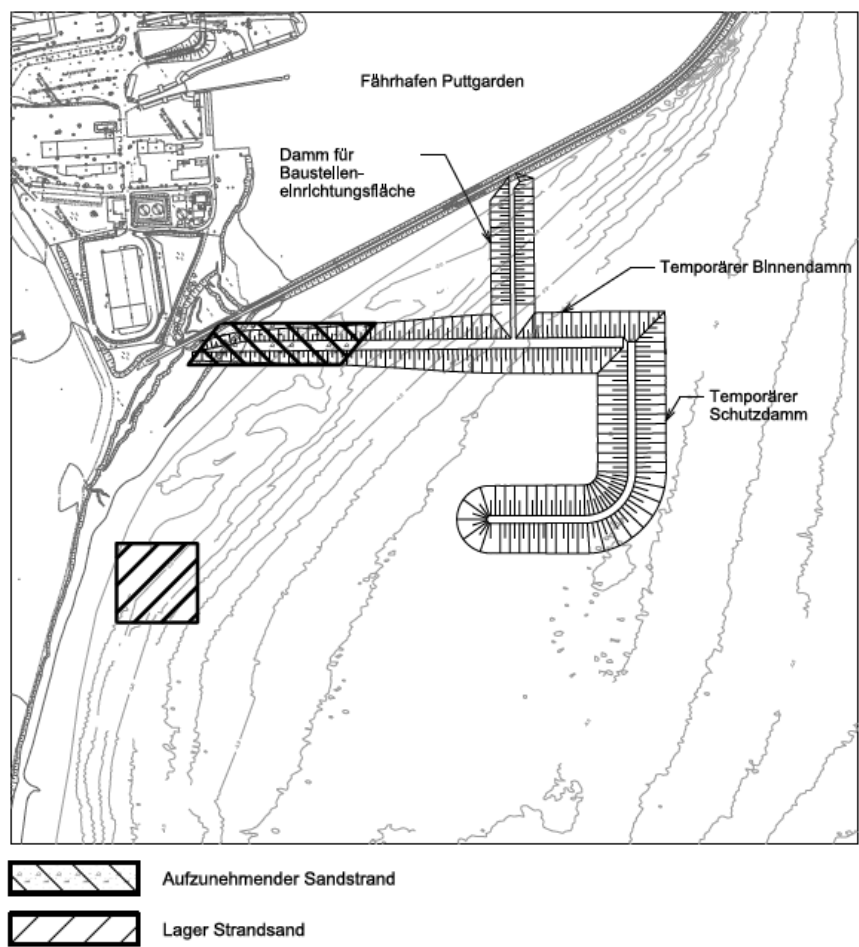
Construction phase 1 (month 0–1): Building a temporary protection embankment, inner dyke and embankment for construction site areas, including areas used for storing and depositing sand.
